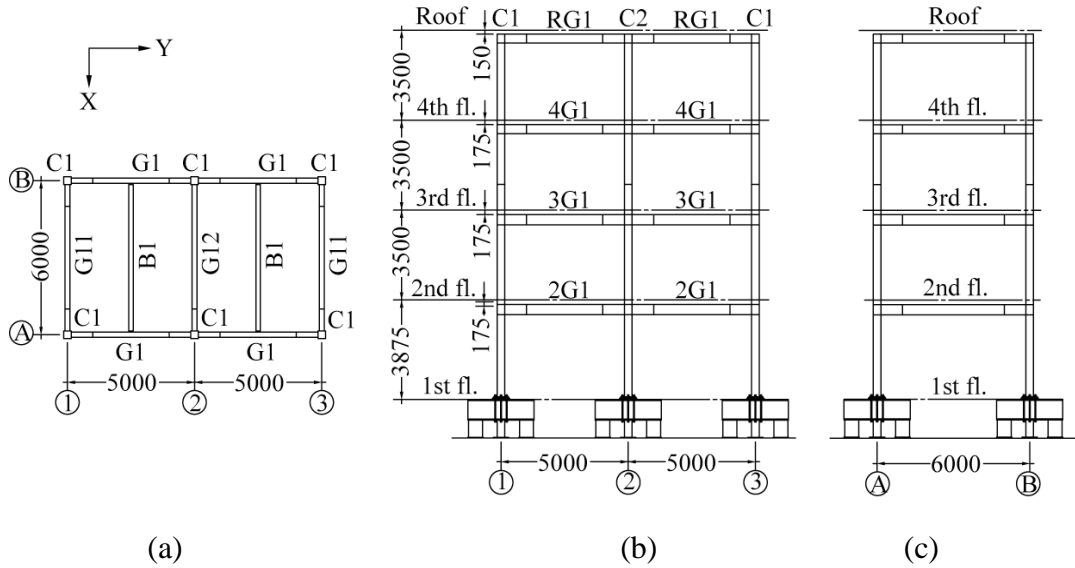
4-story steel frame model; (a) plan, (b), Y-elevation, (c) X-elevation [6].
